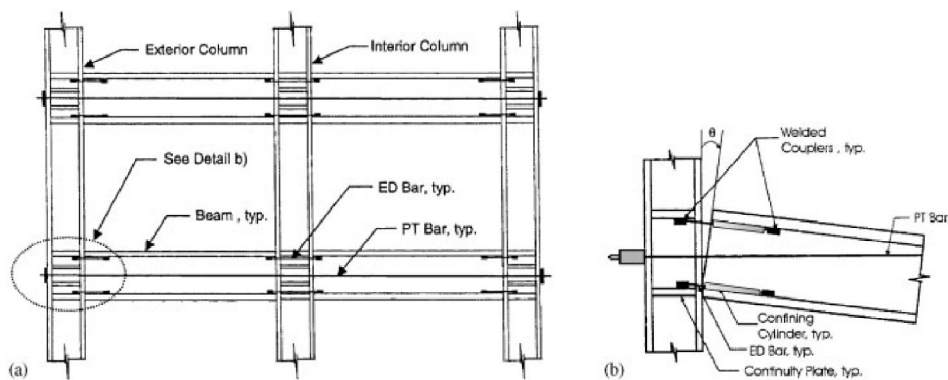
Concept of PTED steel connection: (a) steel frame with PTED connections; (b) deformed configuration of exterior PTED connection (after Christopoulos, et al 2002)
